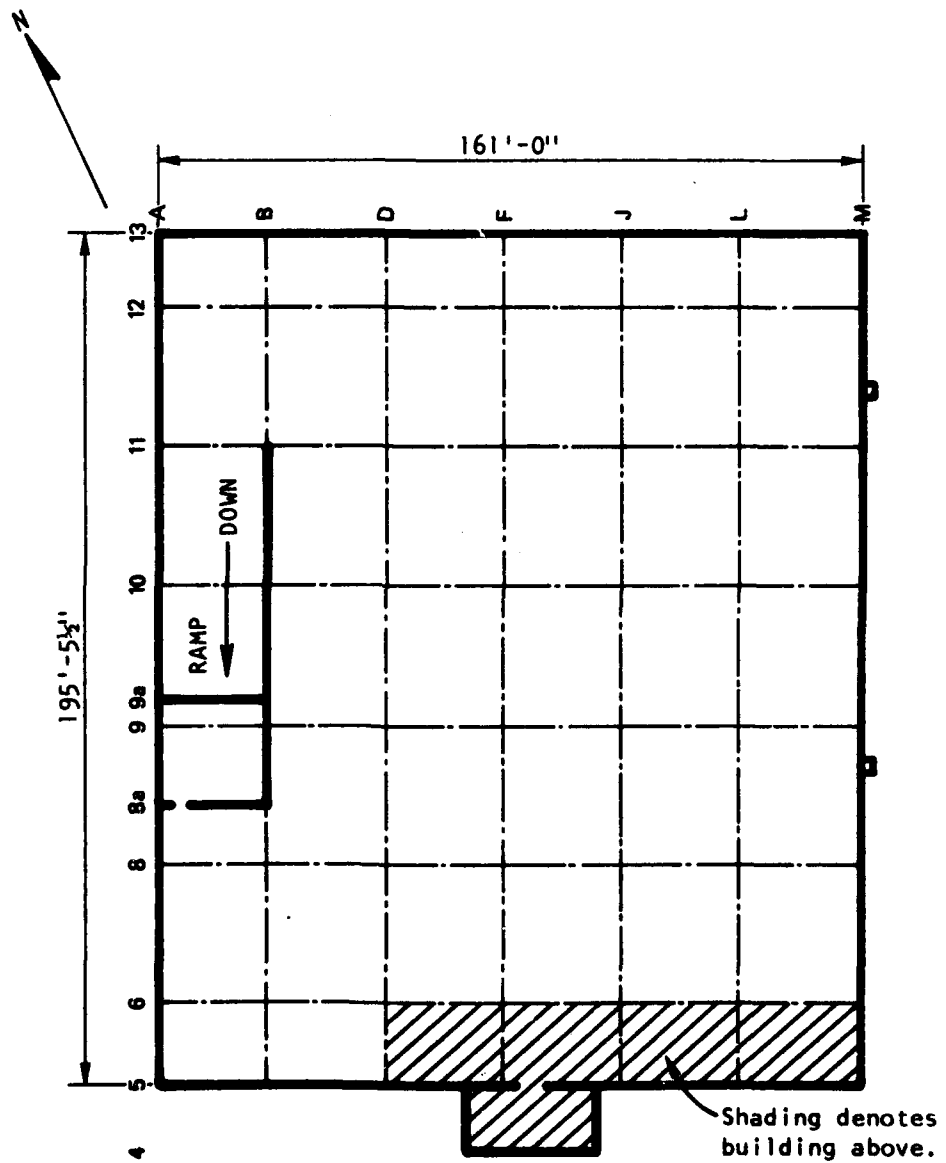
PLAN VIEW, MIDDLEFIELD UNDERGROUND GARAGE
